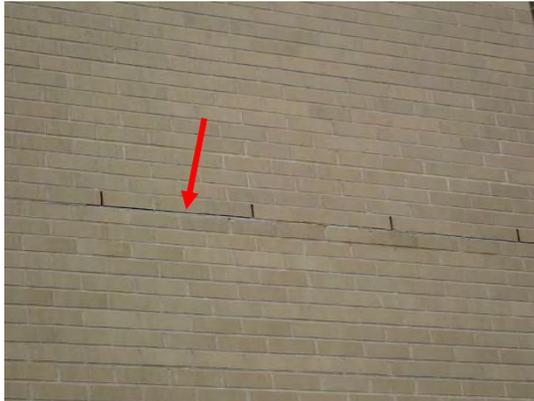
Deterioration of mortar joints below the brick shelf angles at the floor line.
